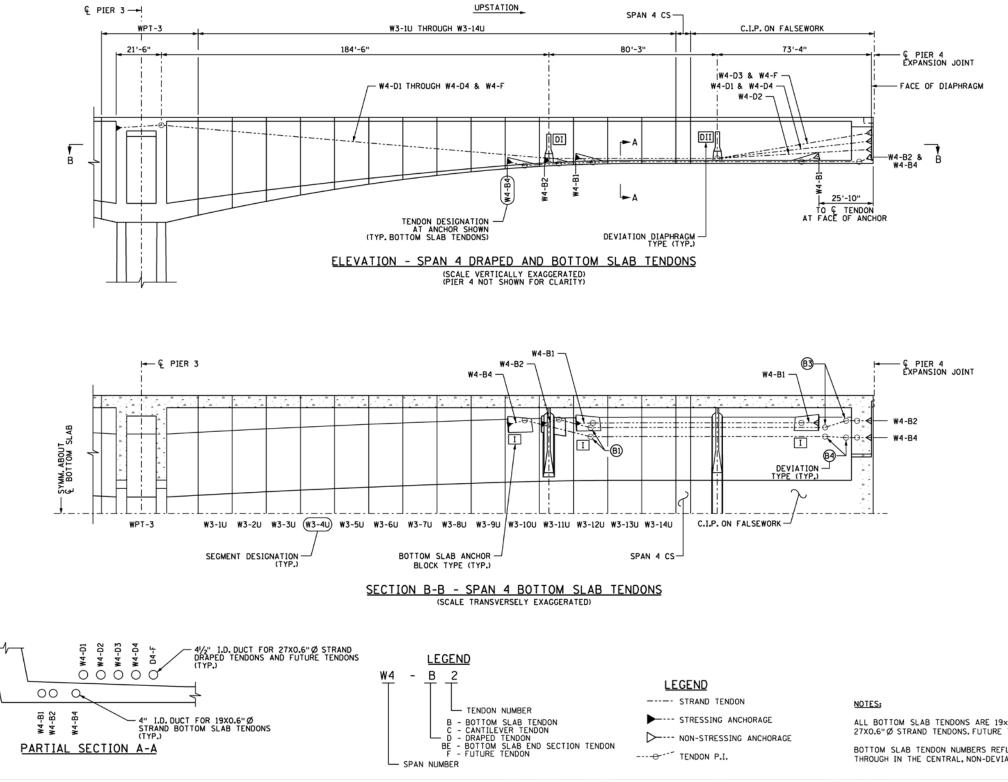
Westbound Span 4 Draped and Bottom Slab Post-Tensioning Layout
